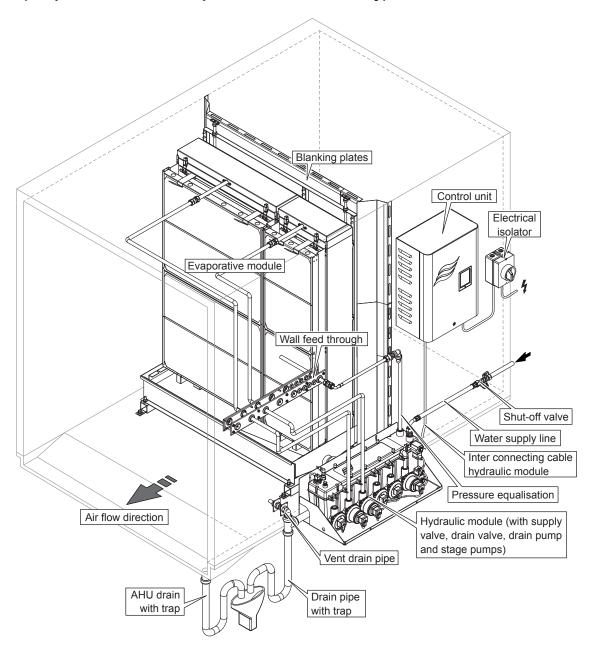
Typical system Condair ME Control, external install with side drain tank (evaporative modules up to 3000 mm wide only)
